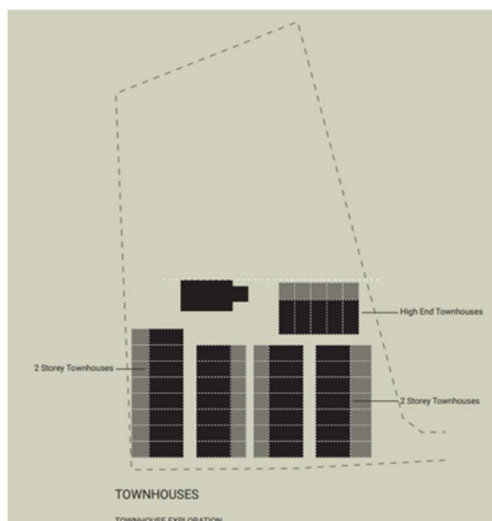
'Townhouse exploration' option for 34 townhouses, including higher density of dwellings to Riverview Terrace Source: Plus Architecture, 2024.
